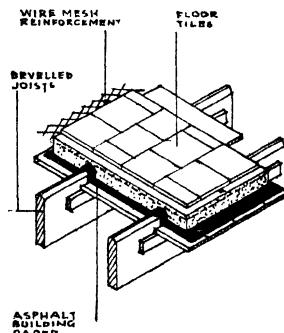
TILE AND CONCRETE FLOOR LAID ON BOARDING AND ASPHALT PAPER
